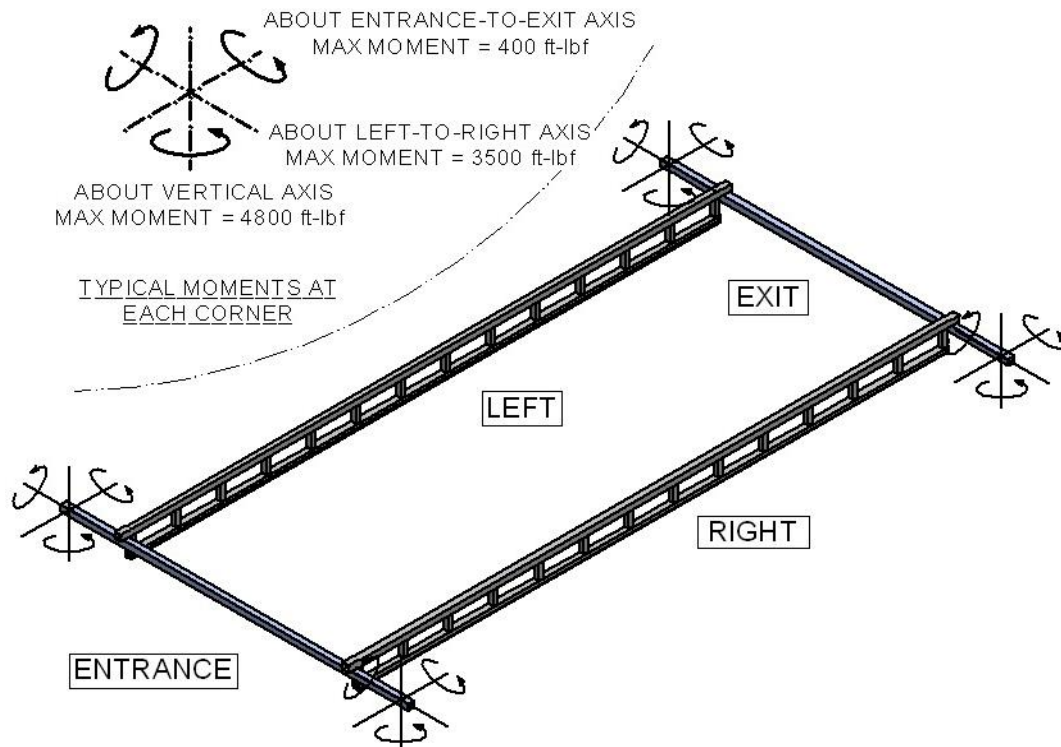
Maximum Moments Exerted on Building Walls, Frame mounted to Site-Supplied Wall Beams.
